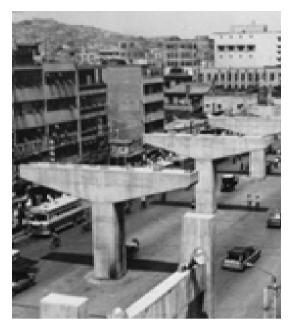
Example of deck support structure for the BRT. Source: Minhocão Collection - Elevado Costa e Silva - 1970¹.
